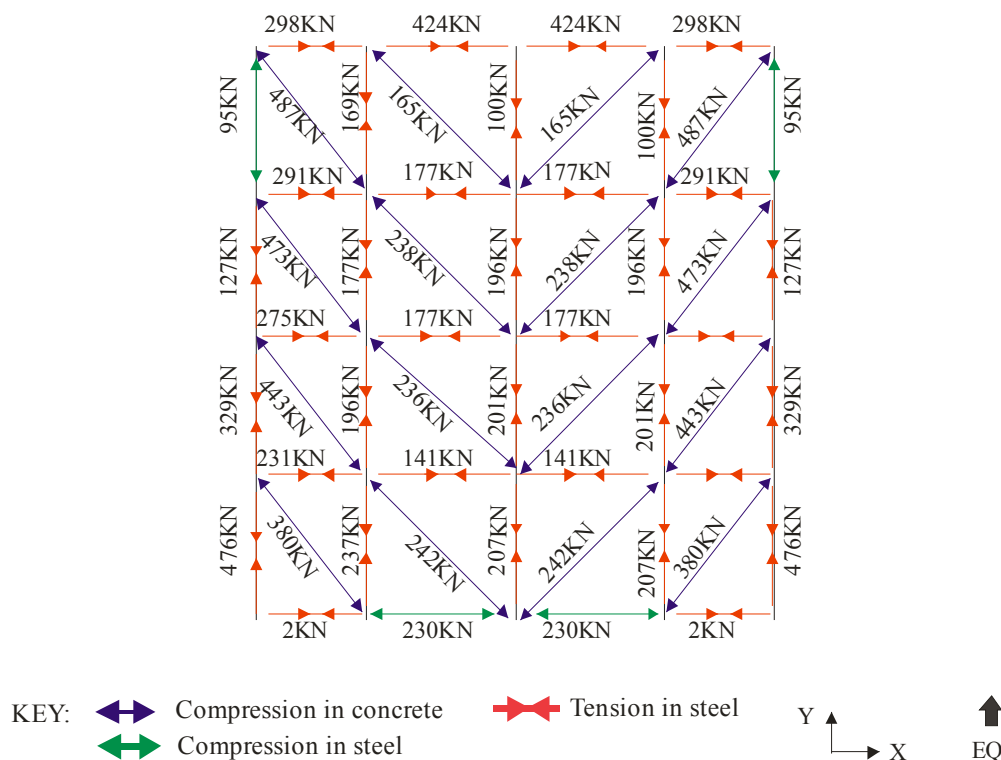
Strut and tie solution for 1:1 geometry floor plan with compression strut angle of 52 degrees at the columns for coarse mesh
